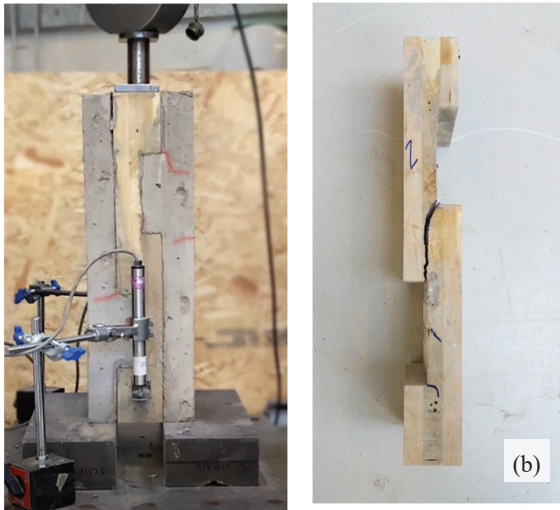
(a) Typical fracture in concrete (1), (b) failure in CLT for notched specimens (3)
